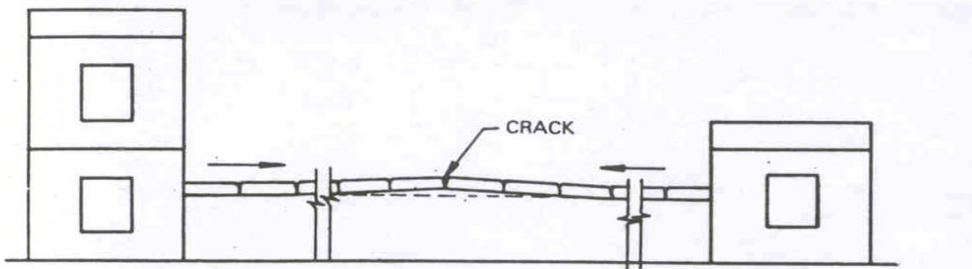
Arching up and Cracking of Coping Stones of a Long Garden Wall
